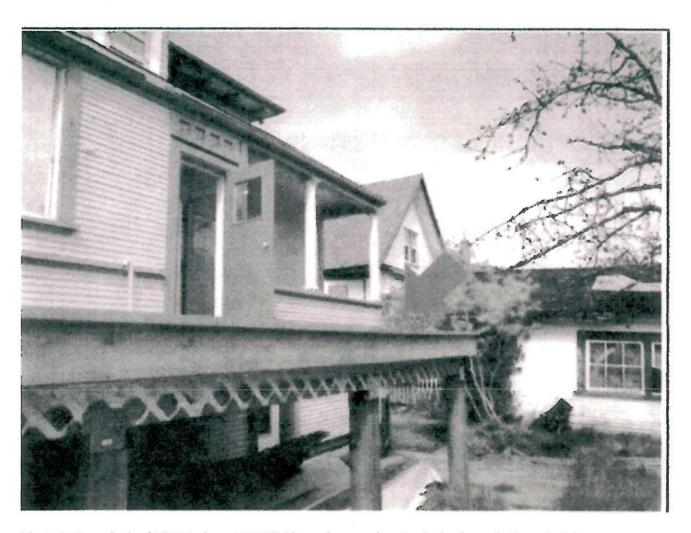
Rear deck of 135 Medana in 2012. The red arrow denotes lack of guardrails and stairs
